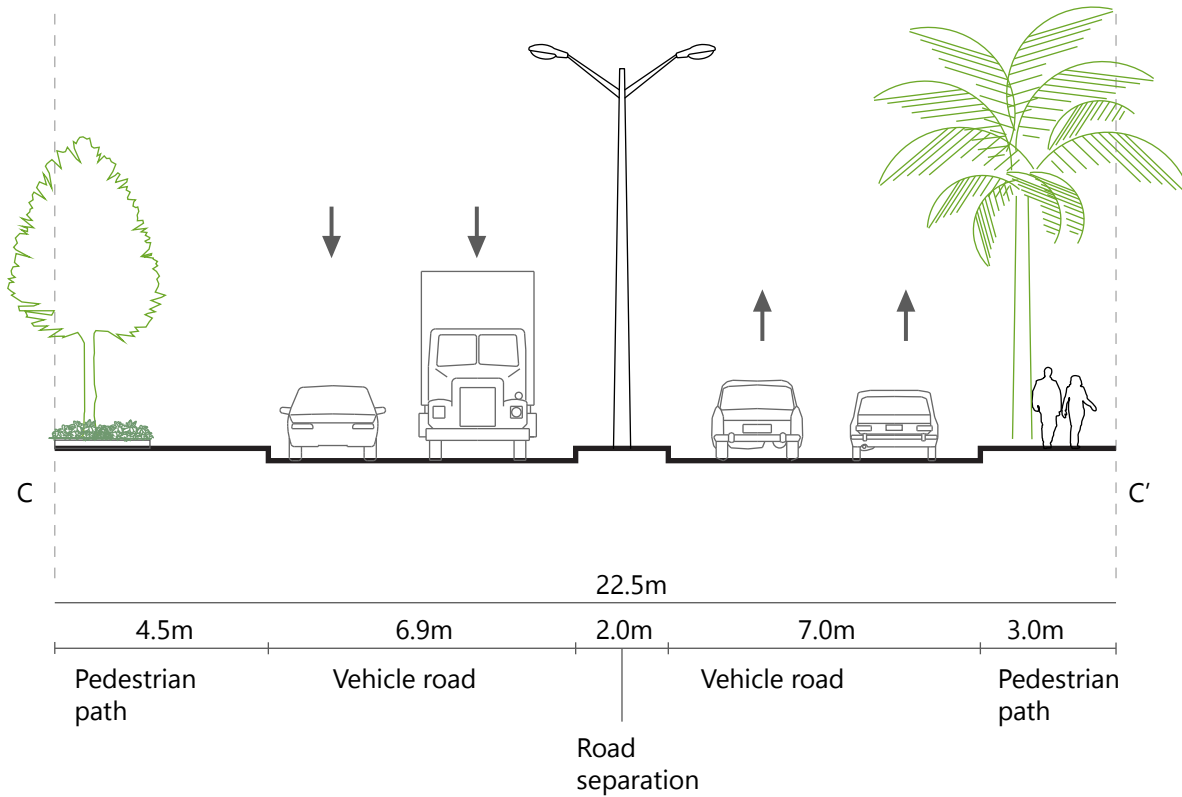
90 Road- Ha'arava road Section Scheme, Source: Author
